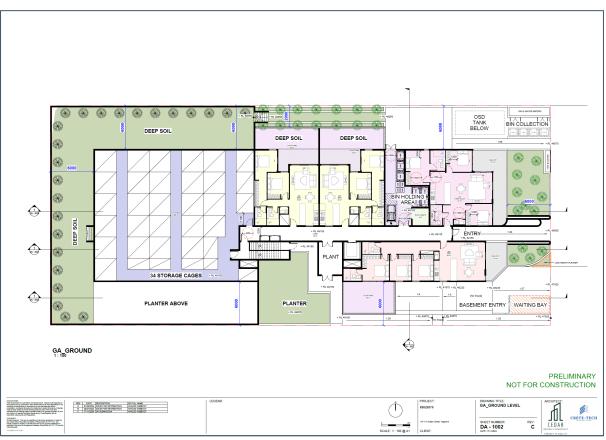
Proposed ground floor plan (Source: Cedar Design & Construct)
